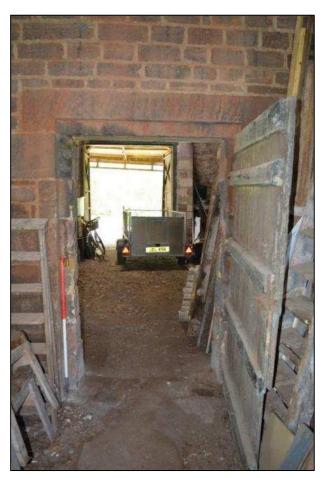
(Shot 87): Doorway in east elevation of barn (Building 1) looking west from lean-to structure (Building 4) through Room 1a (1m scale)
